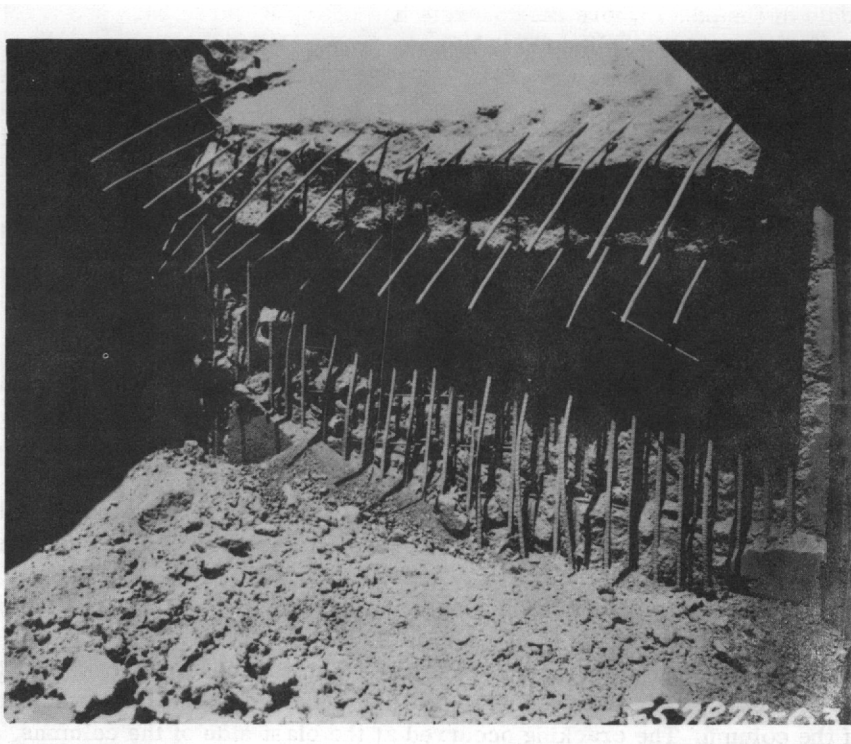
Detail of failure showing fractured bars (postshot).
